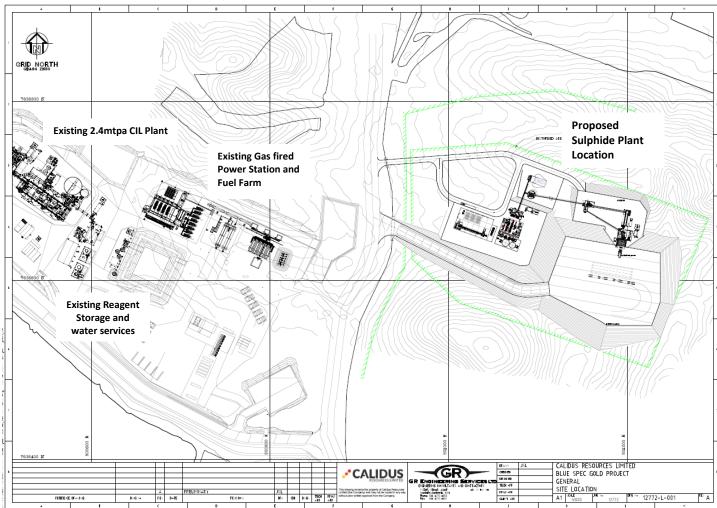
General Arrangement showing Existing 2.4mtpa CIL Plant at Warrawoona and planned Sulphide Plant location
